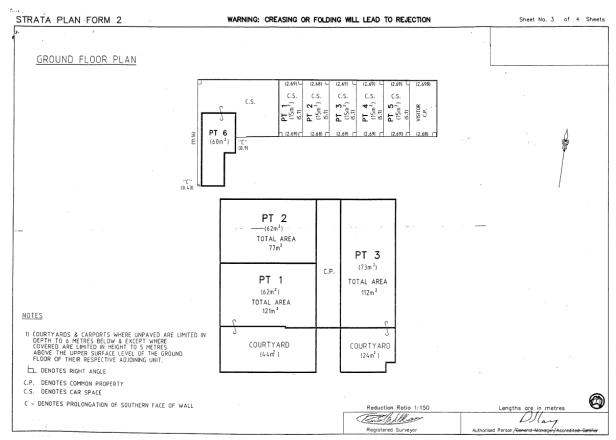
Extract of Strata Plan demonstrating the inclusion of the building as part of Lot 6
